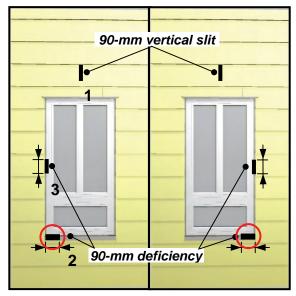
Front elevation of 2.44-m by 2.44-m specimen (cladding exterior) showing location of 90-mm deficiencies (missing sealant, backer rod at specimen face)
